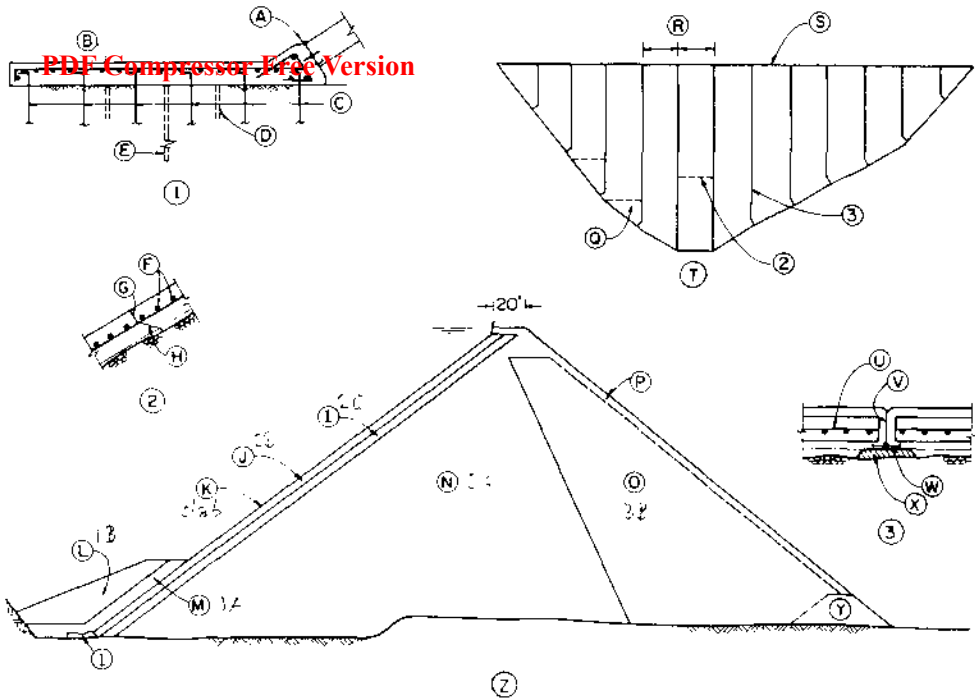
Current practice for zoning of CFRD constructed of sound rockfill on a strong rock foundation (adapted from ICOLD 1989a). (1) Toe slab, (2) Horizontal joint, (3) Vertical joint. (A) Perimetric joint, (B) Steel reinforcement, (C) Anchor bars, (D) Consolidation grout holes, (E) Grout curtain, (F) Horizontal reinforcement, (G) With form, (H) Broom joint, (I) Zone 2E, selected small rock placed in the same layer thickness as Zone 2D, (J) Zone 2D, processed small rock, (K) Concrete face, (L) Zone 1B, random, (M) Zone 1A, impervious soil, (N) Zone 3A, quarry run rock fill or gravel fill, about 1.0 m layers, (O) Zone 3B, quarry run rock fill or gravel fill, about 1.5 to 2.0 layers, (P) Available large size rock dozed to face, (Q) Starter slab, (R) 18 m (60 feet), (S) Straight axis, (T) Elevation of face, (U) Horizontal reinforcement, (V) Surface painted with asphalt, (W) Copper waterstop, (X) Mortar pad, (Y) Zone 3D, plus 0.3 m rockfill, (Z) Section of dam.
